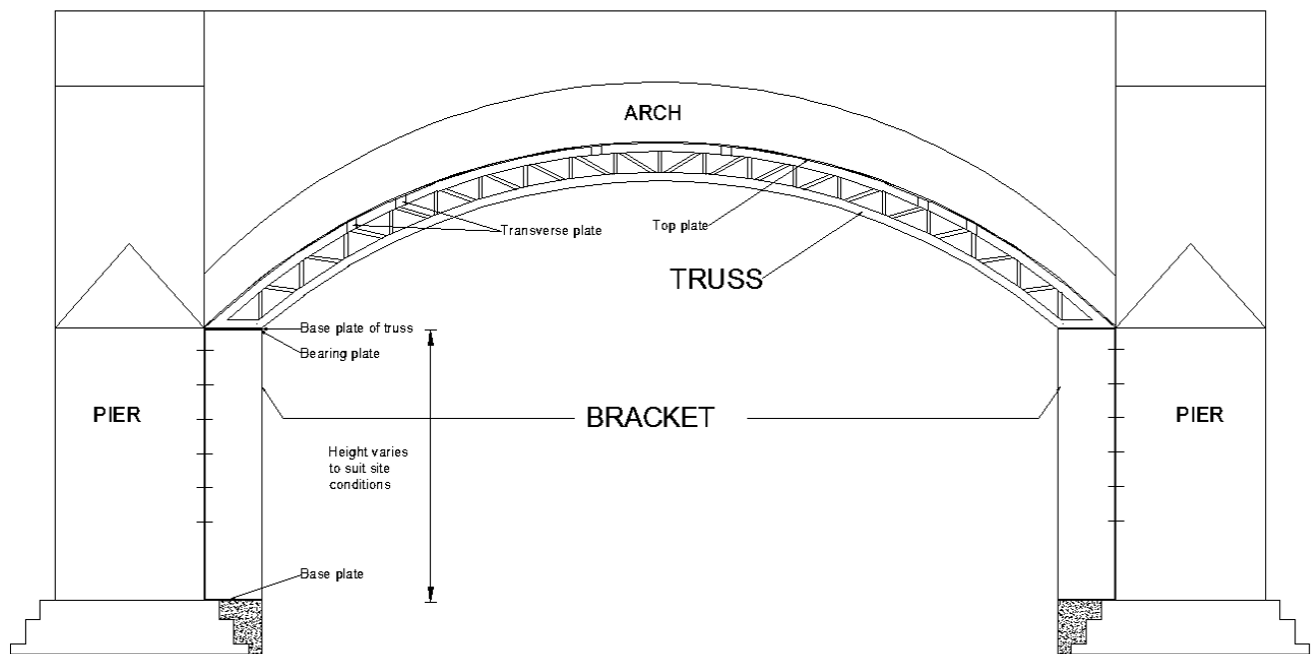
Schematic of the proposed supporting arrangement for retrofitting
